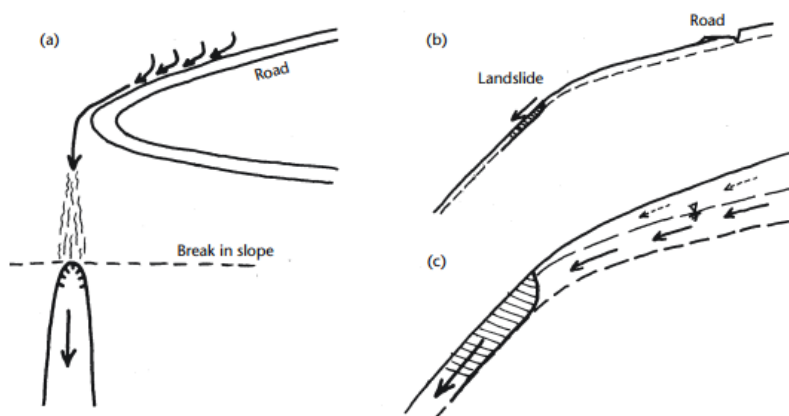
Sketch showing the typical role of a road drainage diversion in triggering a "gentle-over-steep" landslide. (a) Plan view, landslide below a switchback. (b) Cross-section showing typical point of landslide initiation. (c) Enlargement, showing convergence of groundwater due to thinning soil depth at break in slope.
